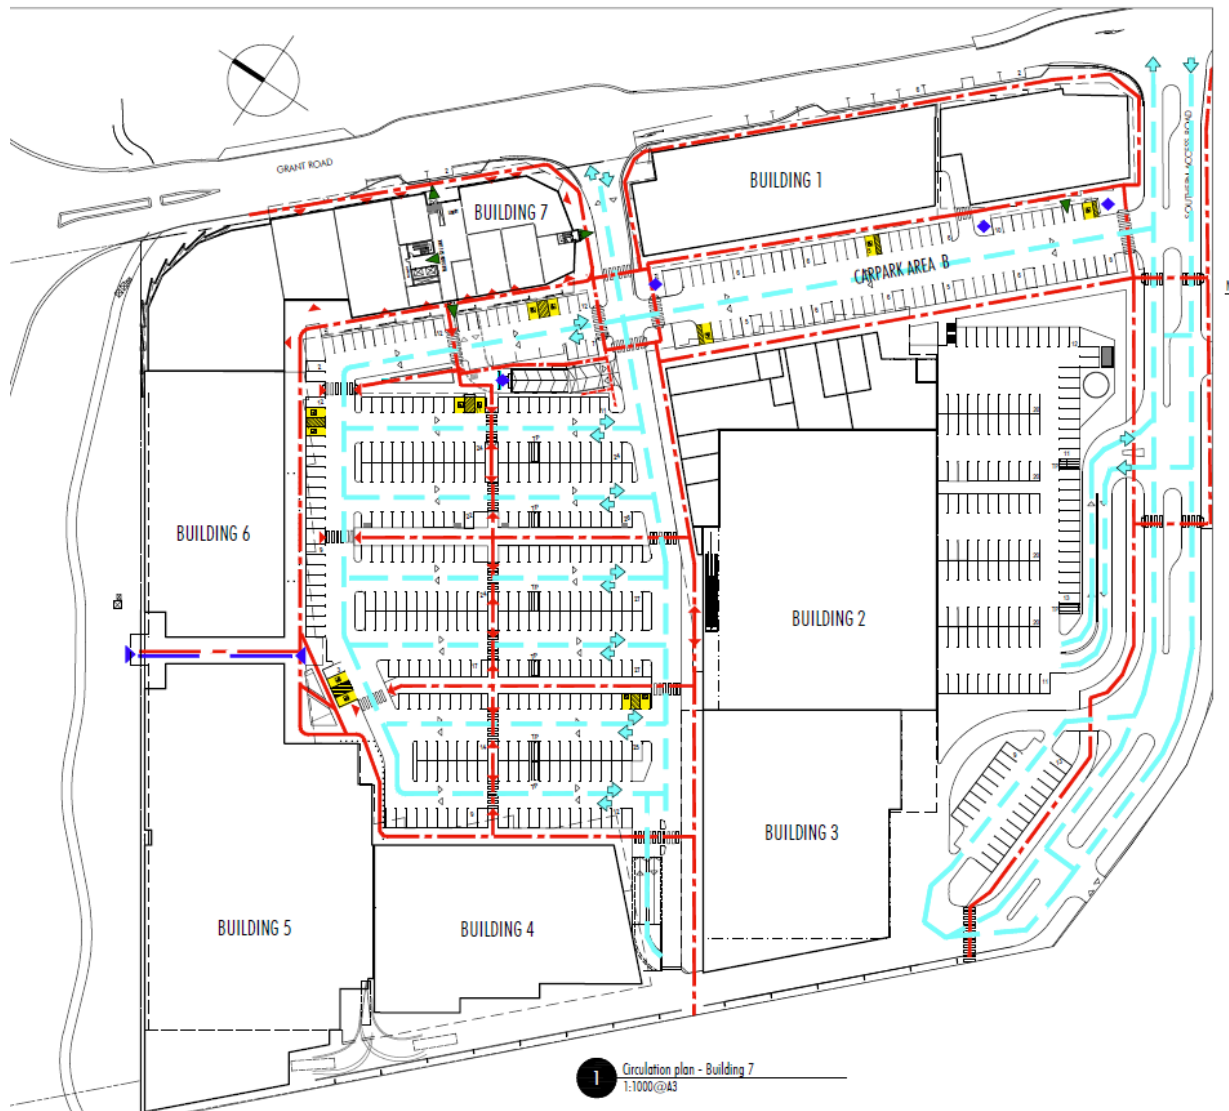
Figure C – Site Plan at “5 Mile” in Frankton showing perimeter building blocks and carparking
